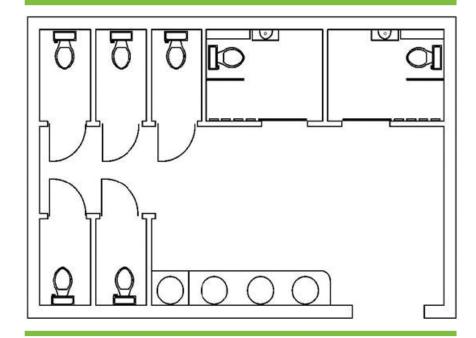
Design layout for girls' toilet blocks with accessible toilet cubicles
